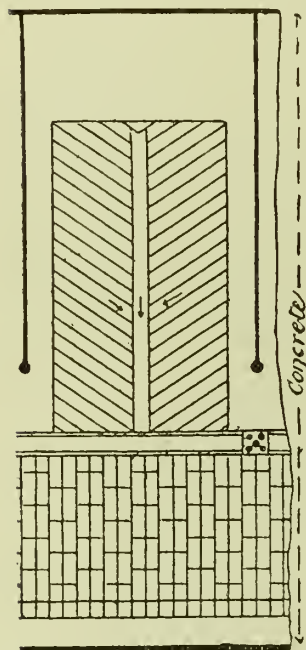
Stable with Grooved and Channelled Concrete Paving.
